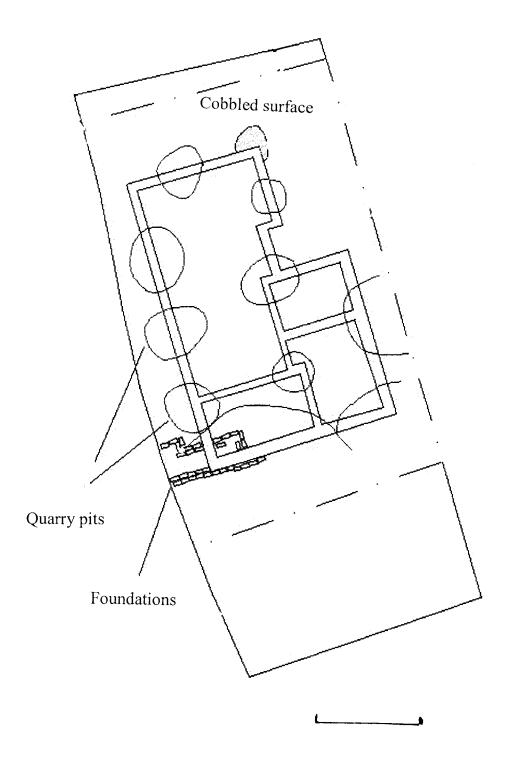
Site plan showing location of quarry pits in relation to the foundation trenches. North is to the top (see also Fig 7). The scale bar denotes 5m
